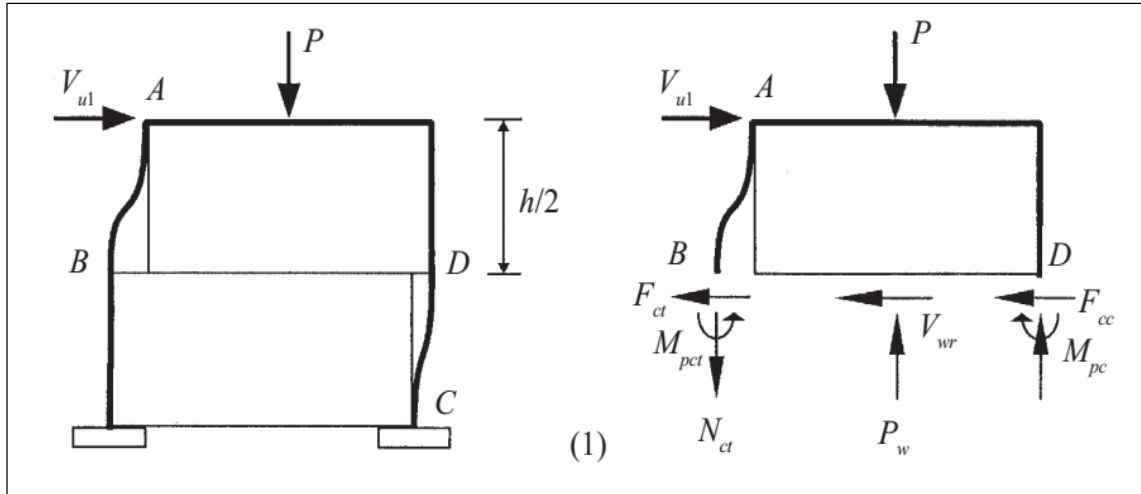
Failure mechanism 1 (Mehrabi & Shing, Seismic Analysis of Masonry-Infilled Reinforced Concrete Frames, 2003)
